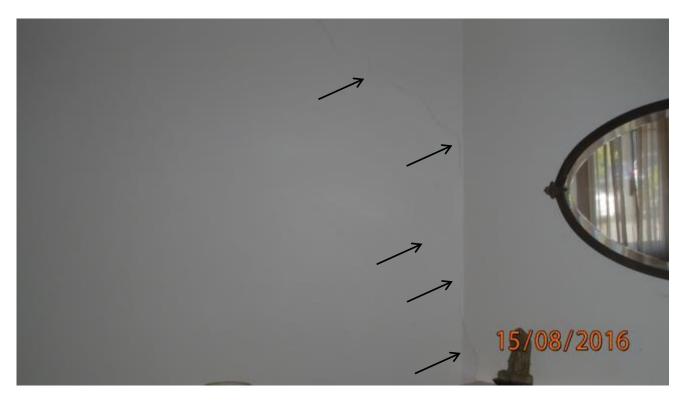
shows the junction of the timber roofing bearer with the common party wall.
